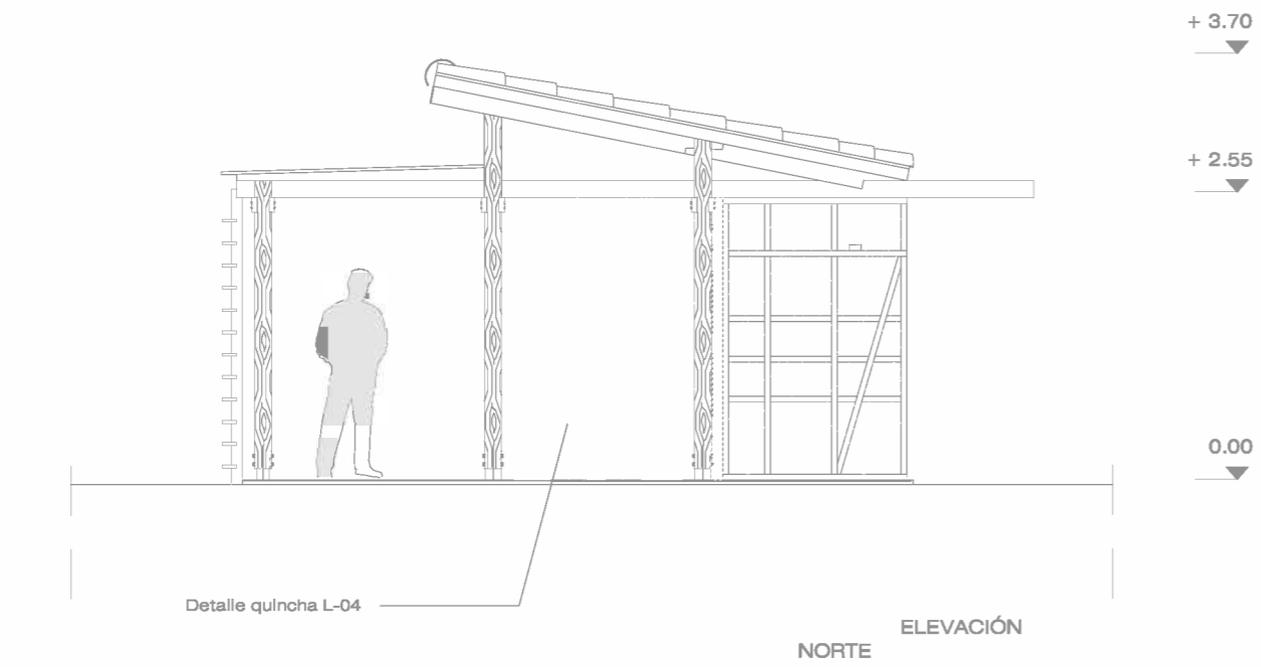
Built Prototype Sections, Elevations and roofing Plan (drawing by Óscar Natividad)
